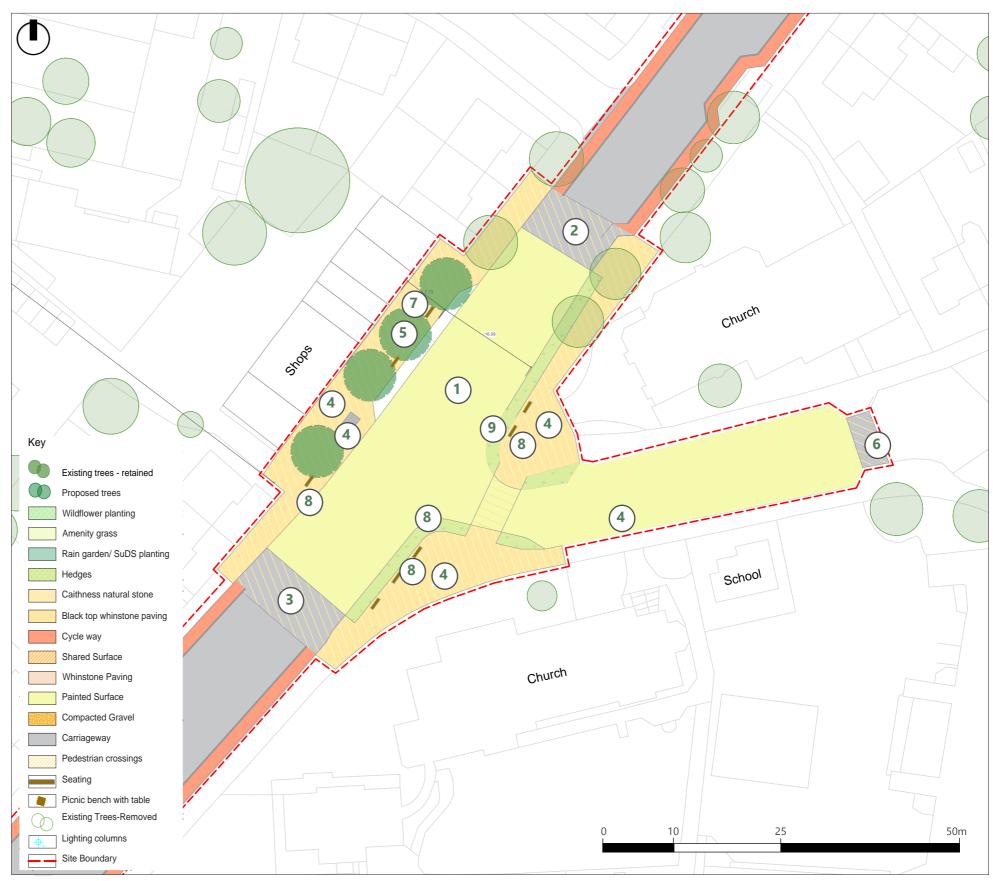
Zoom-in Plan Cumbernauld Road - Smithycroft Road junction
